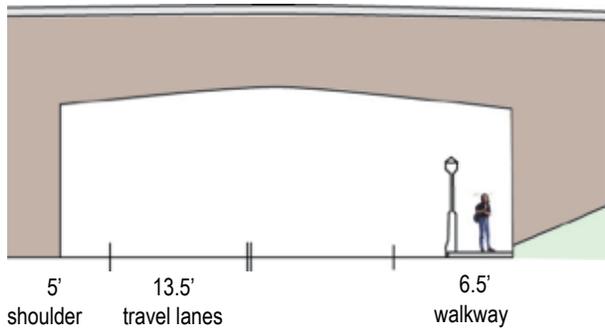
Church Road underpass alternate proposed walkway cross-section looking east
